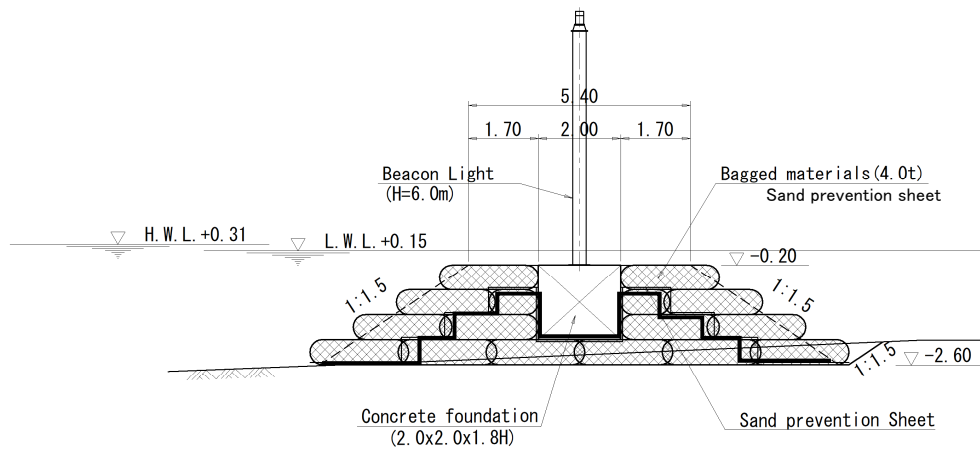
(4) Cross section drawing at tip of submerged breakwater (temporary)
